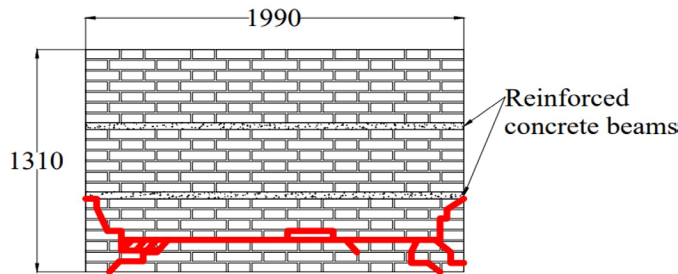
Failure of plain wall with reinforced concrete beams [7].
